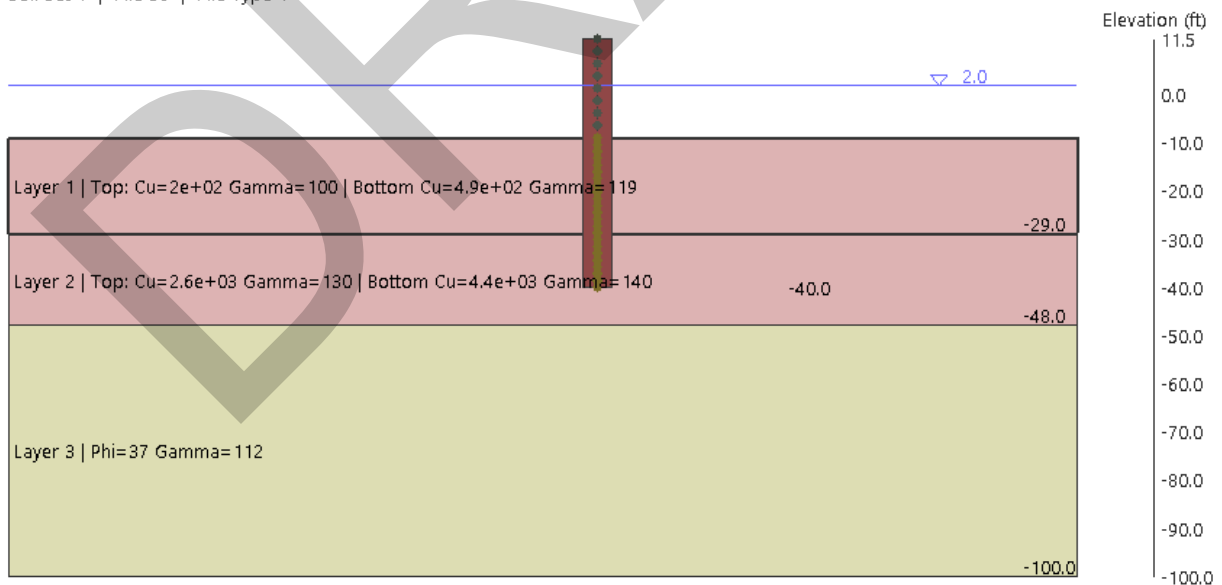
18" SuperPILE Soil Cross Section – C3 Soil
